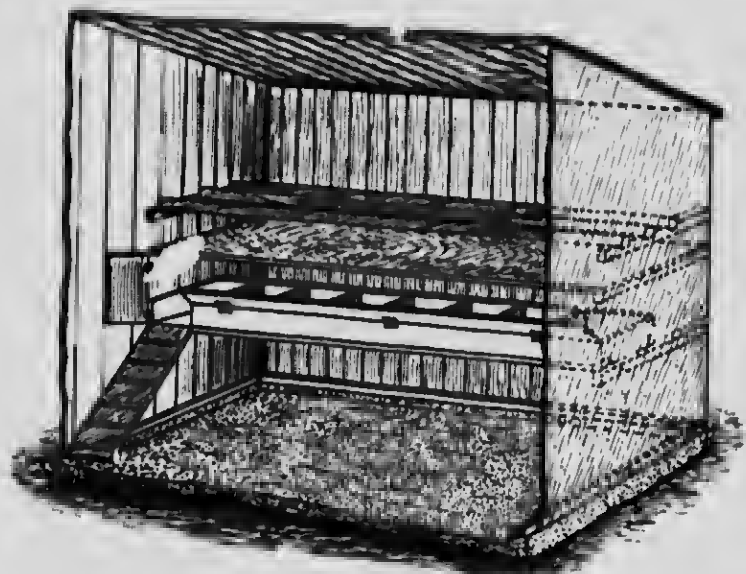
Showing construction of dropping board and nests, which are so arranged that nests are convenient for collecting the eggs, and are also raised off the floor, giving all the floor space for scratching purposes. The dropping board should be well made of matched lumber.
